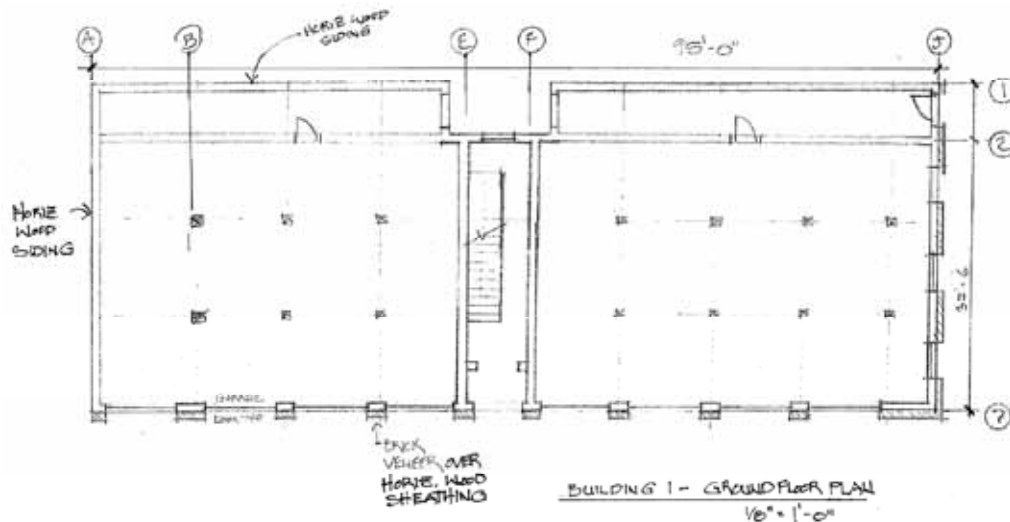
Ground Floor Plan. ATC 53-2A.
